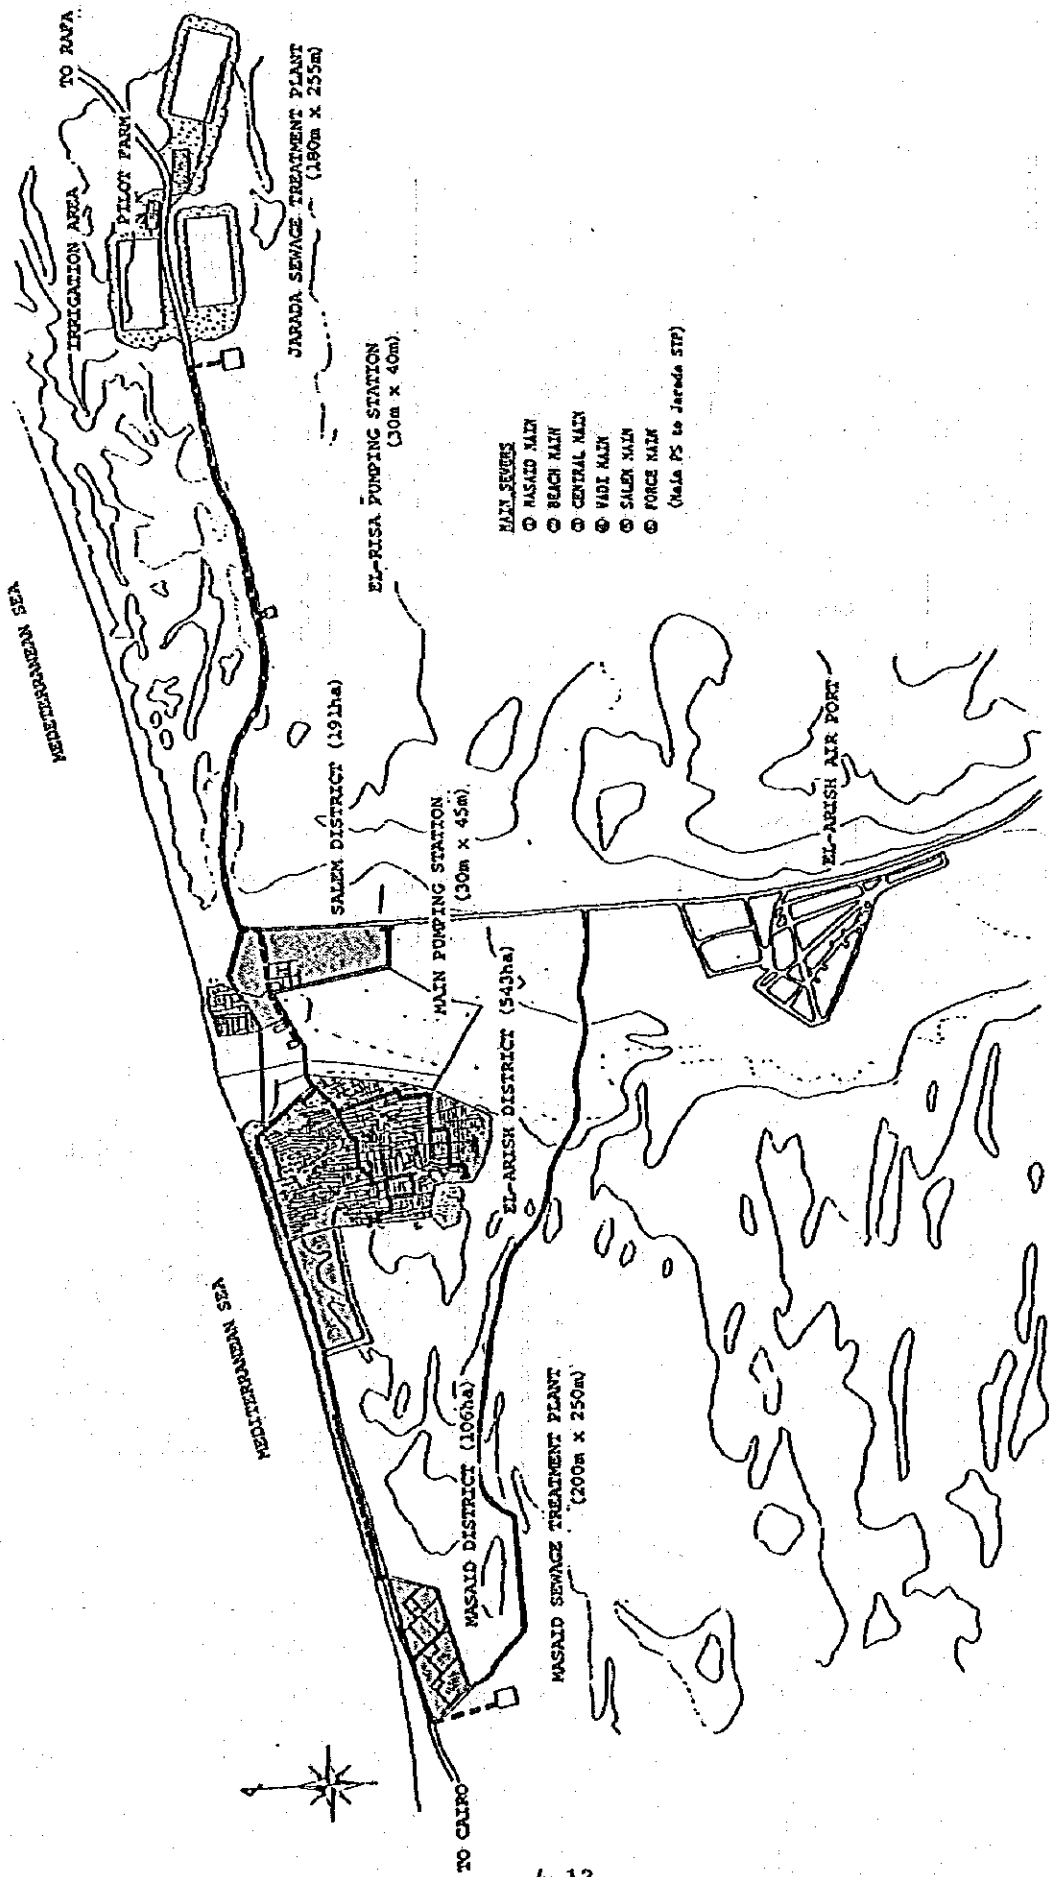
Layout Plan of the Proposed Sewerage System
